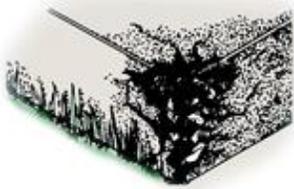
Broken corners on concrete can be repaired with latex cement.
